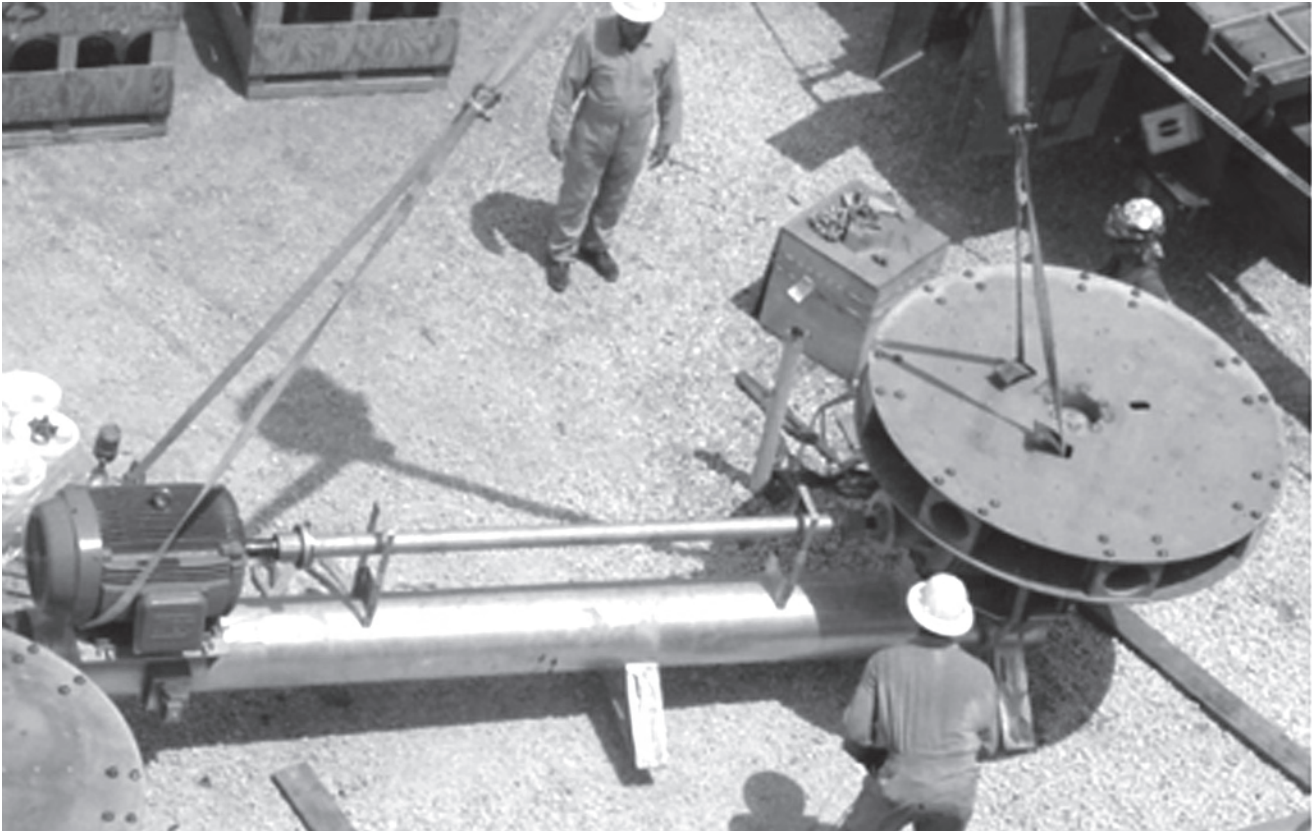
Mechanical equipment mounted on torque tube, before installation of fan blades. Note retaining guards for driveshaft.
